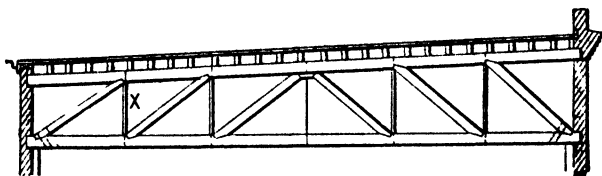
Six-panel Howe Truss with Top Chord Inclined
